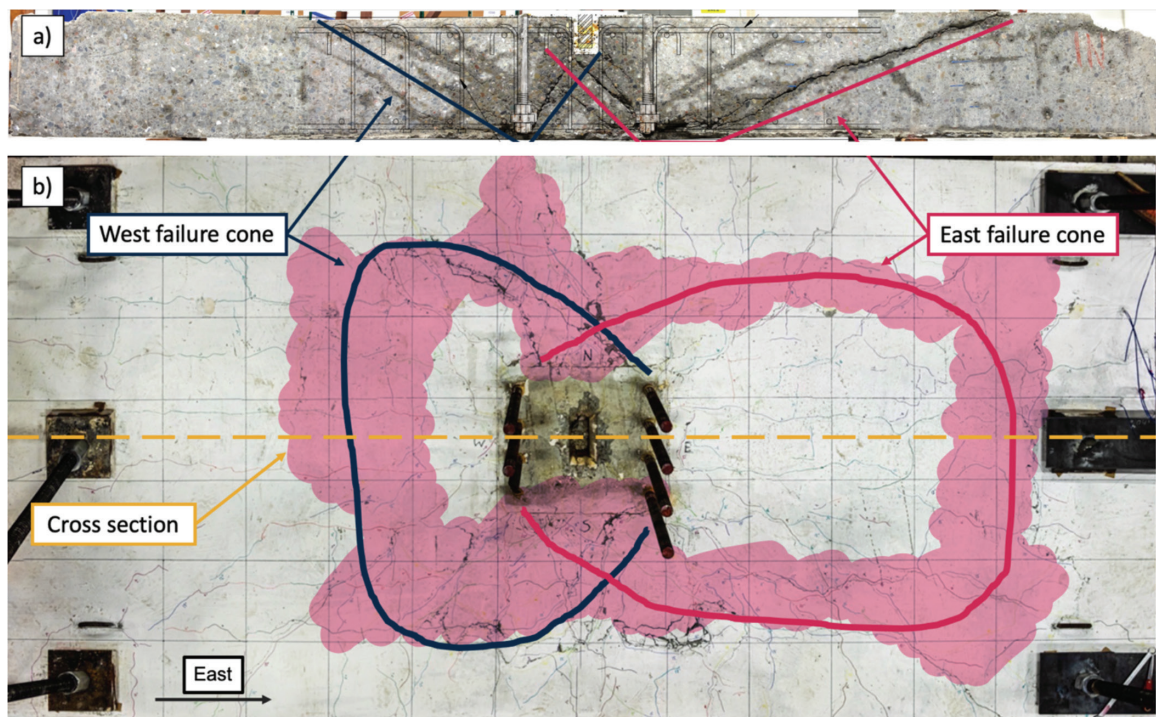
(a) Specimen cross section; and (b) plan view highlighting crack patterns and breakout cone geometry, with 12 x 12 in. (305 x 305 mm) grid for Specimen M02. Shaded region produced hollow sound when knocked.
